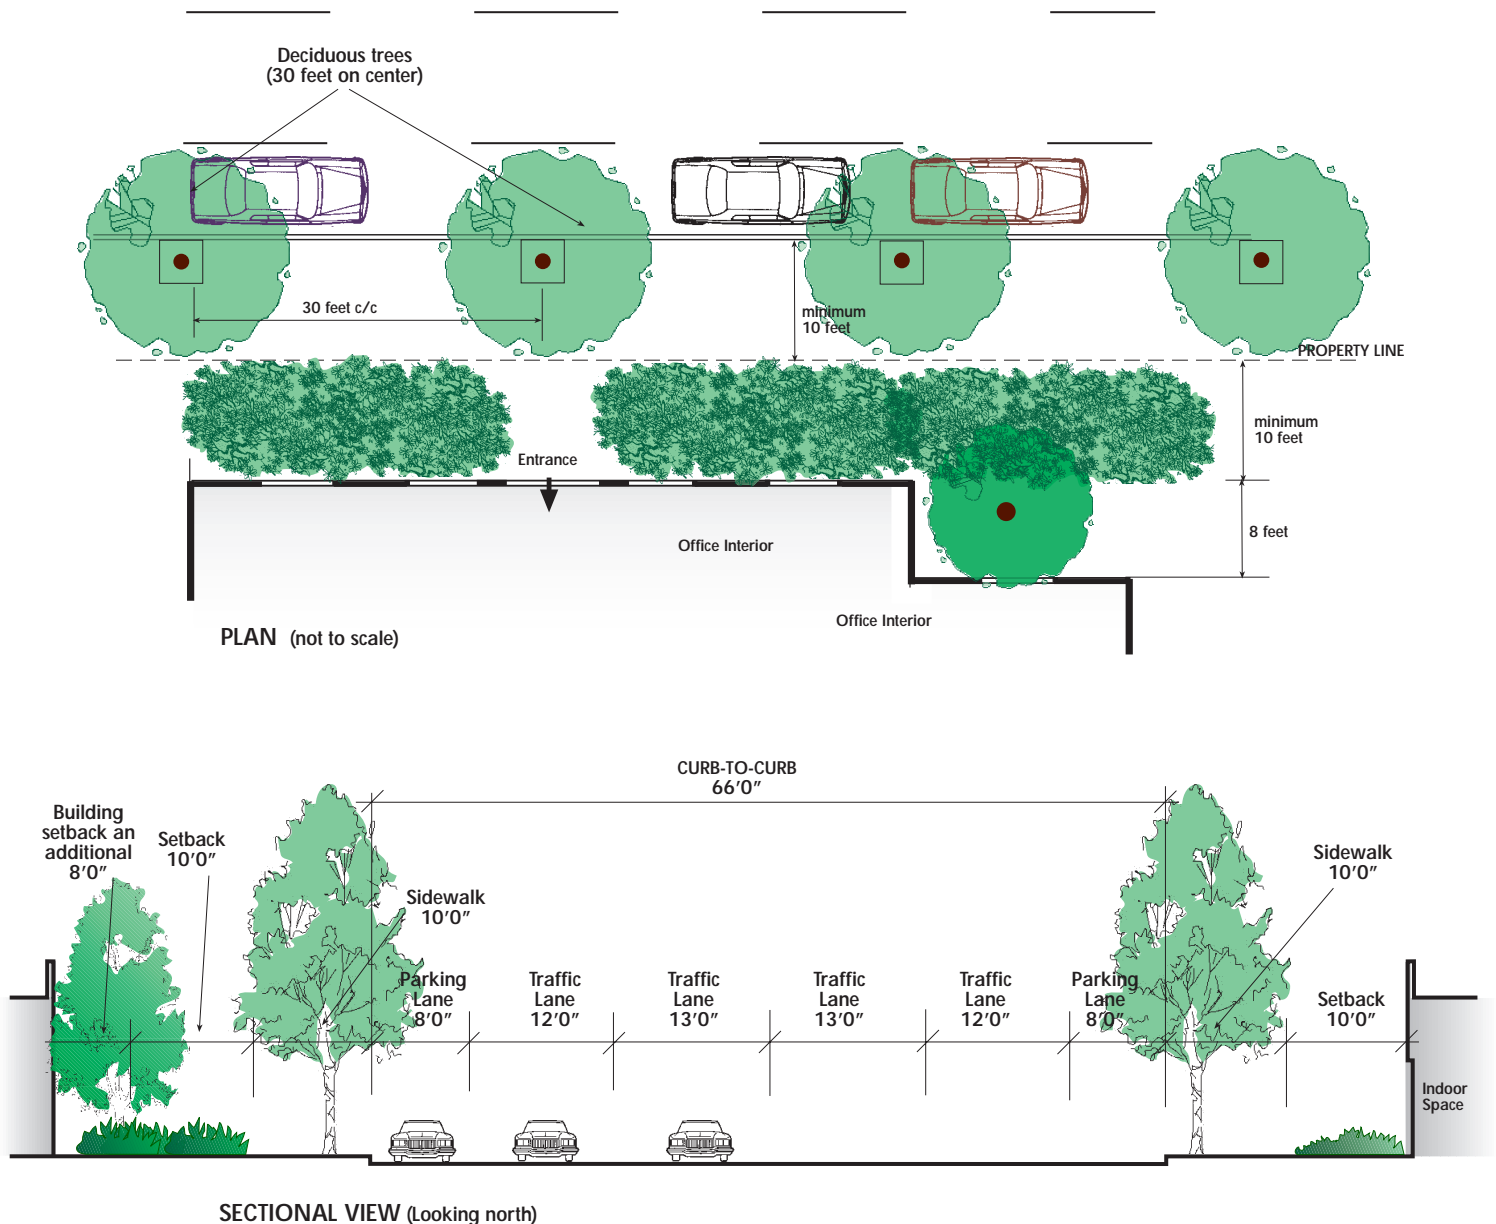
Typical street tree layout (plan and street cross-section) for Long Beach Boulevard
